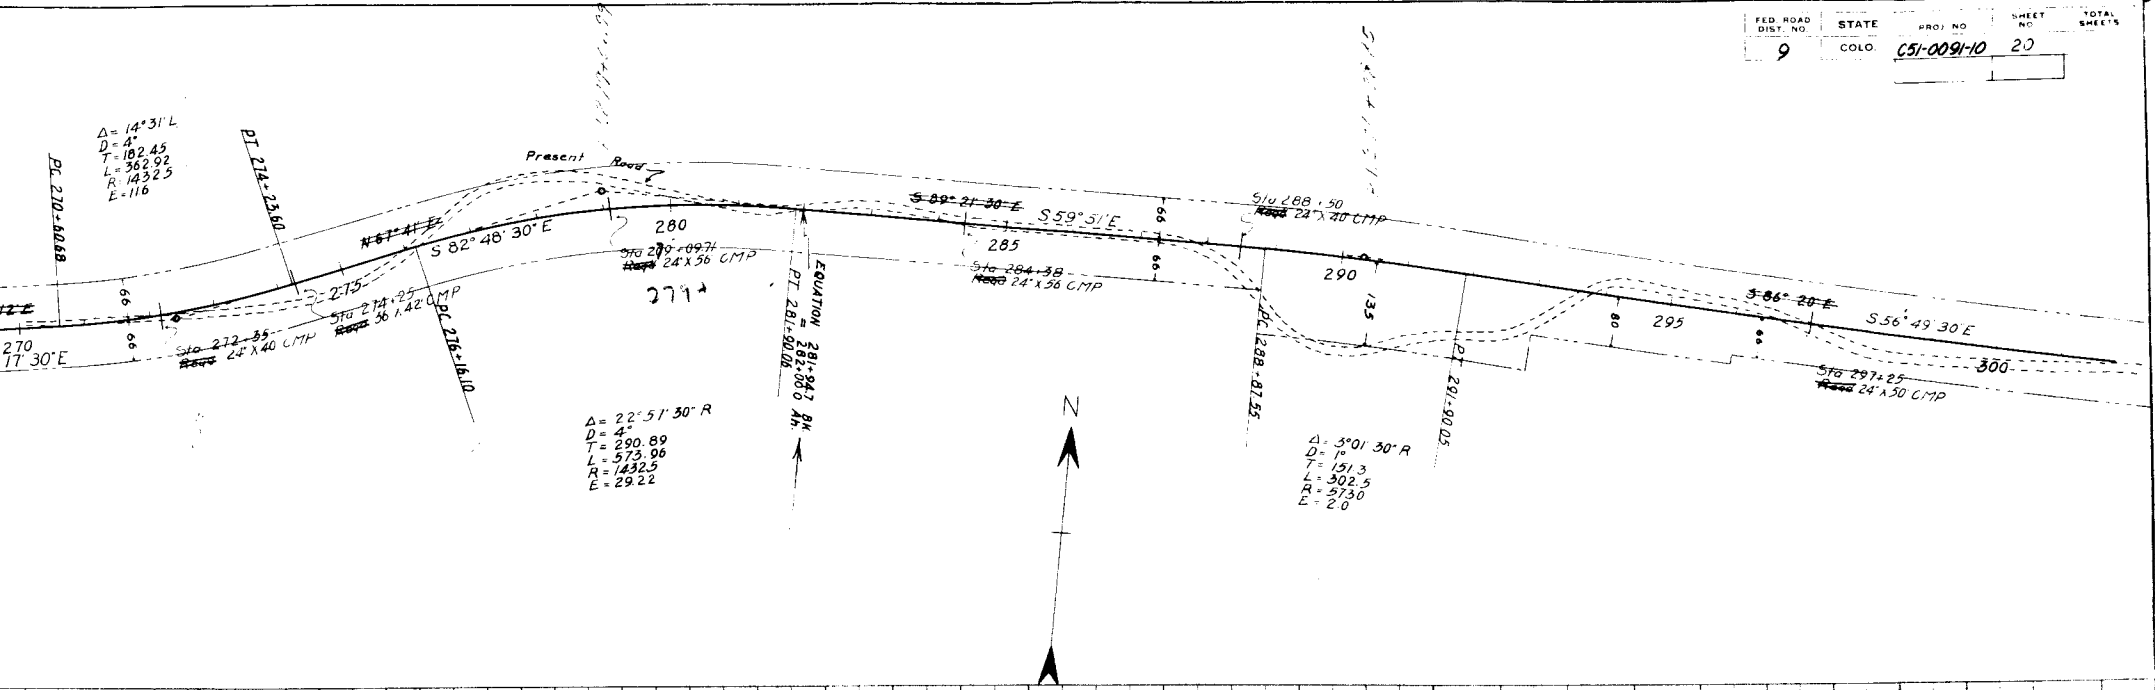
PLAN PROFILE OF ROAD STANDARD
